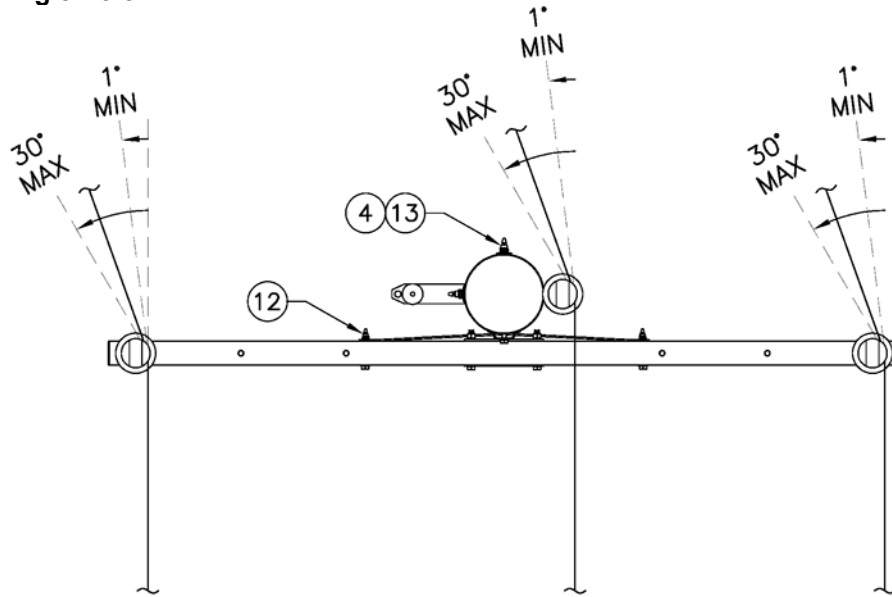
Three-Phase #4 AWG Copper Single Arm Angle Pole Top Assembly
